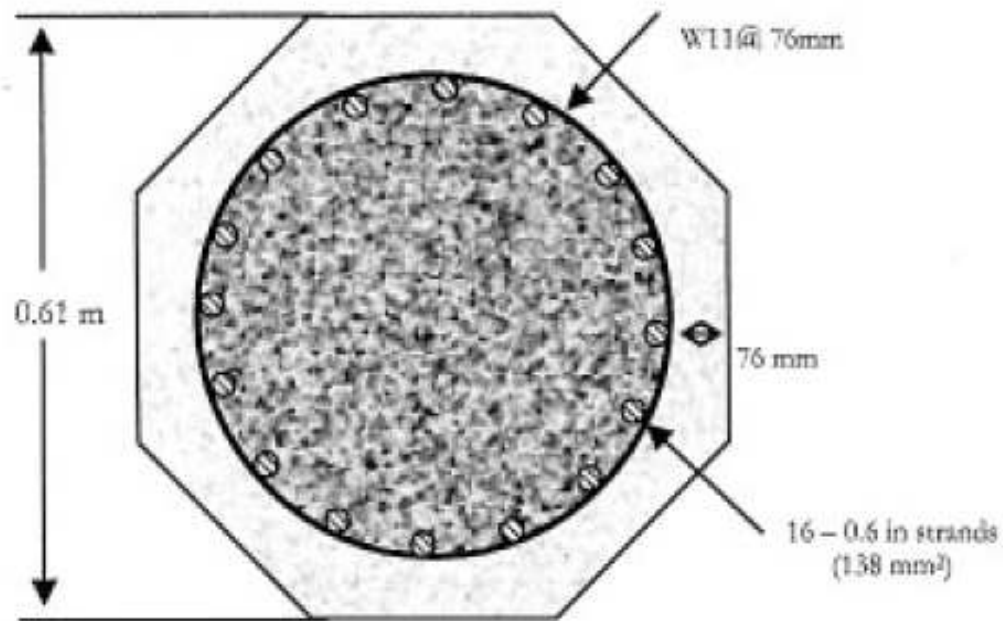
Transverse Section of Prestressed Pile (Blandon, 2007)
